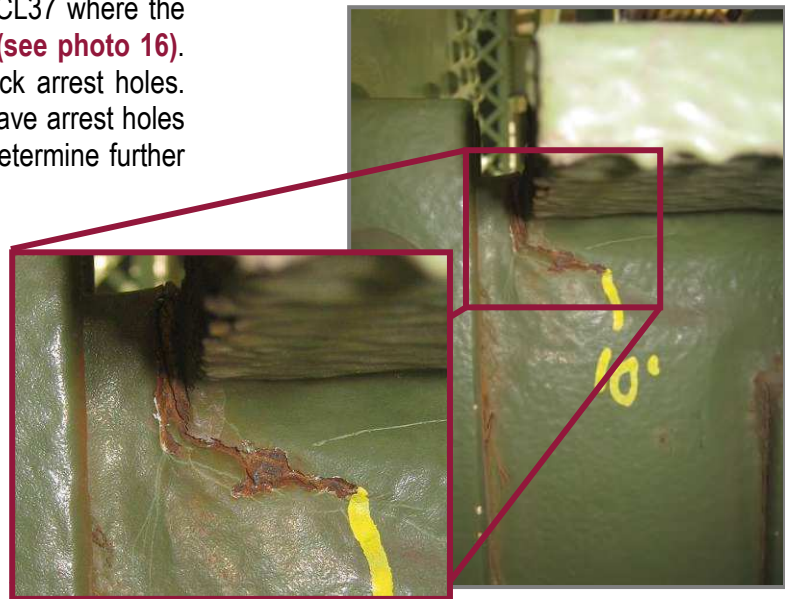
Crack in utility deck floor beam at gusset plate CL36N connection.
